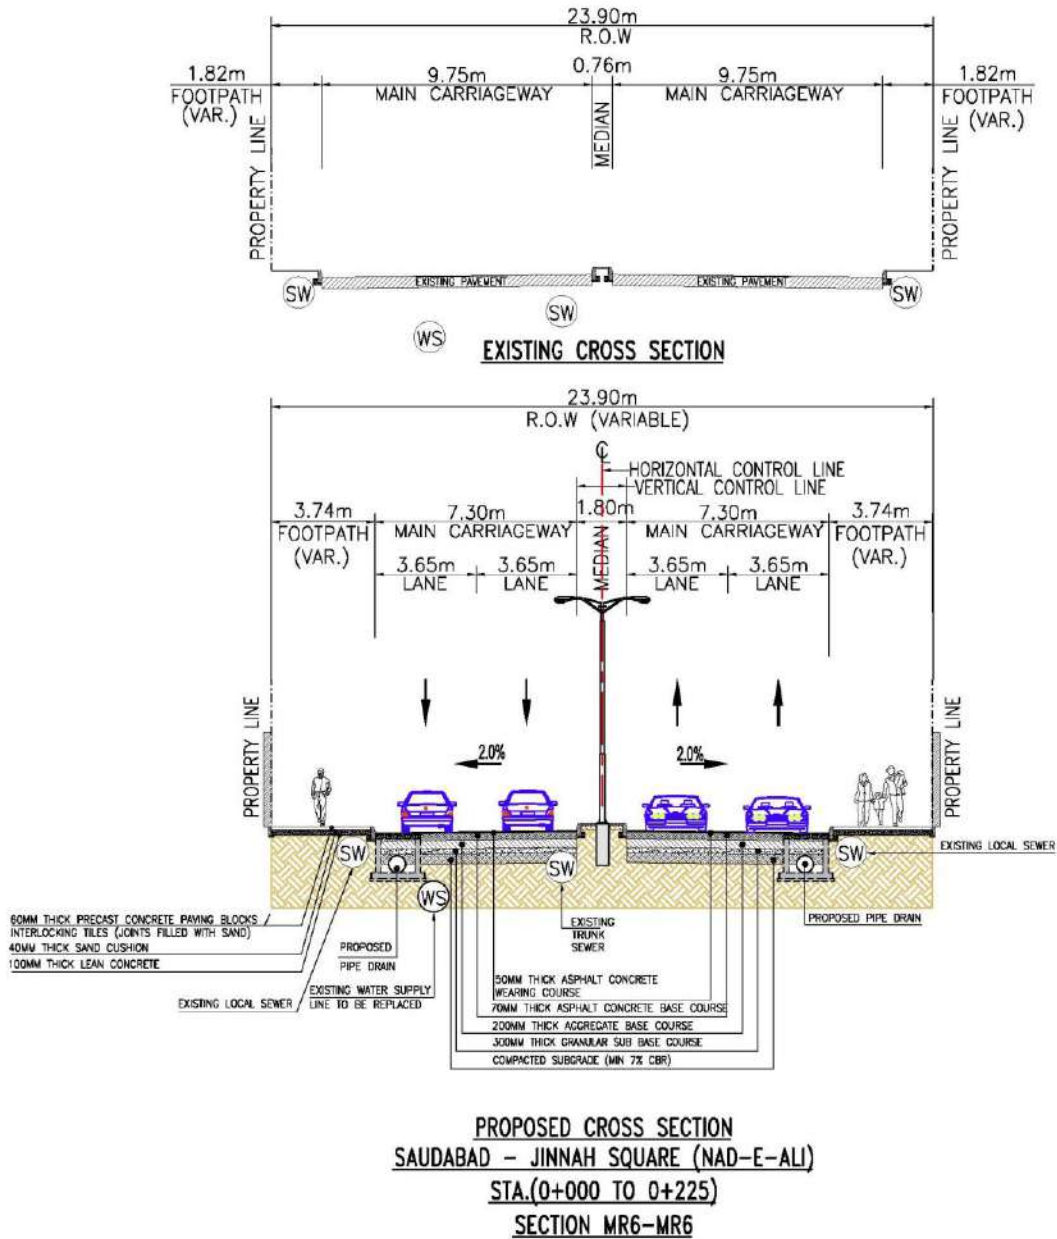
Existing and Proposed Cross Section of Saudabad Chowrangi to Jinnah Square (0+000 to 0+225 km)
